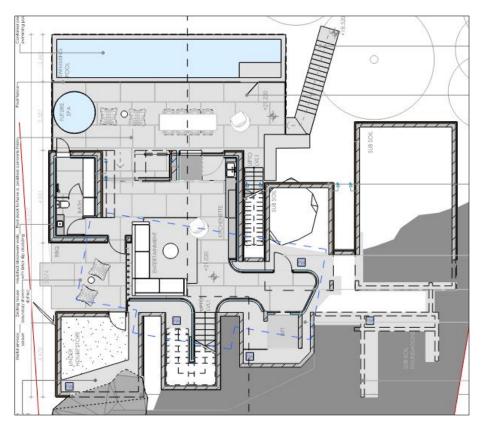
Ground Level floor plan (Source: fitzpatrick + partners architects)
